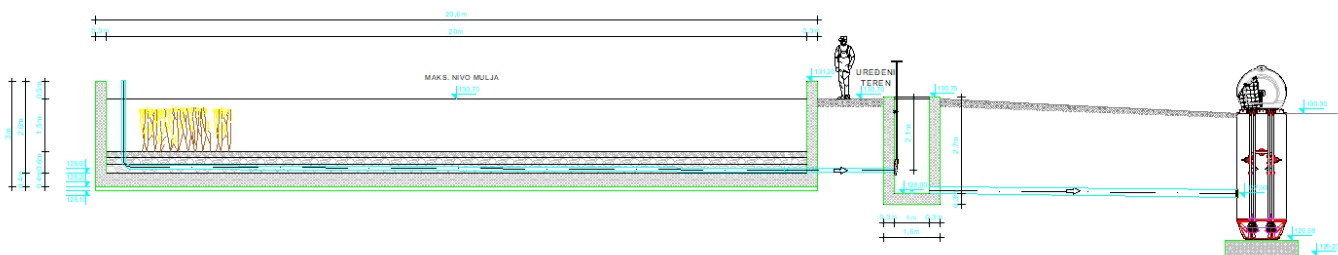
Longitudinal cross-section of RB in Kastelir – sludge distribution (Detailed design, 2016)²⁸
